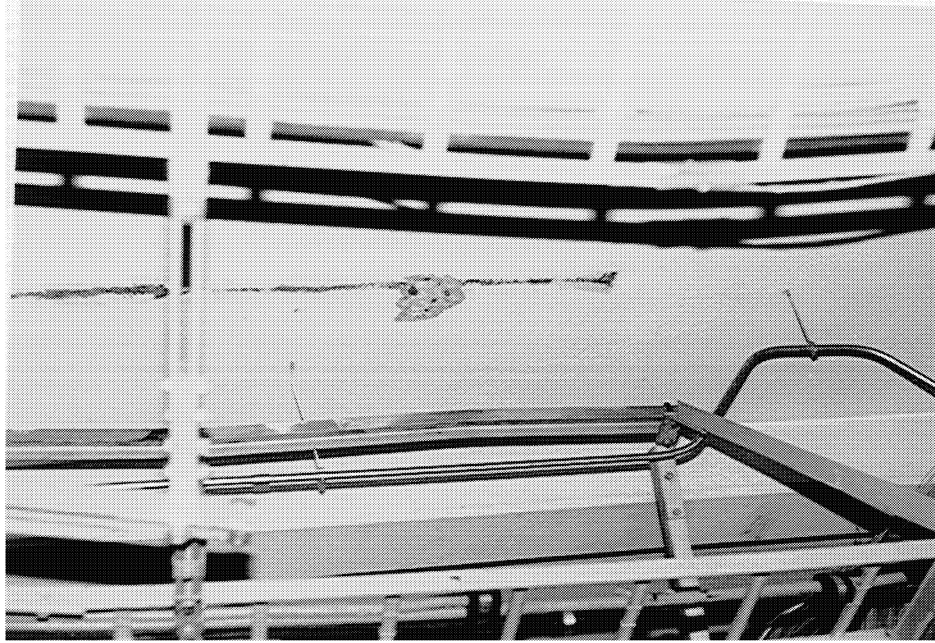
The load on an expansion anchor caused a concrete cone to be pulled from the floor.
